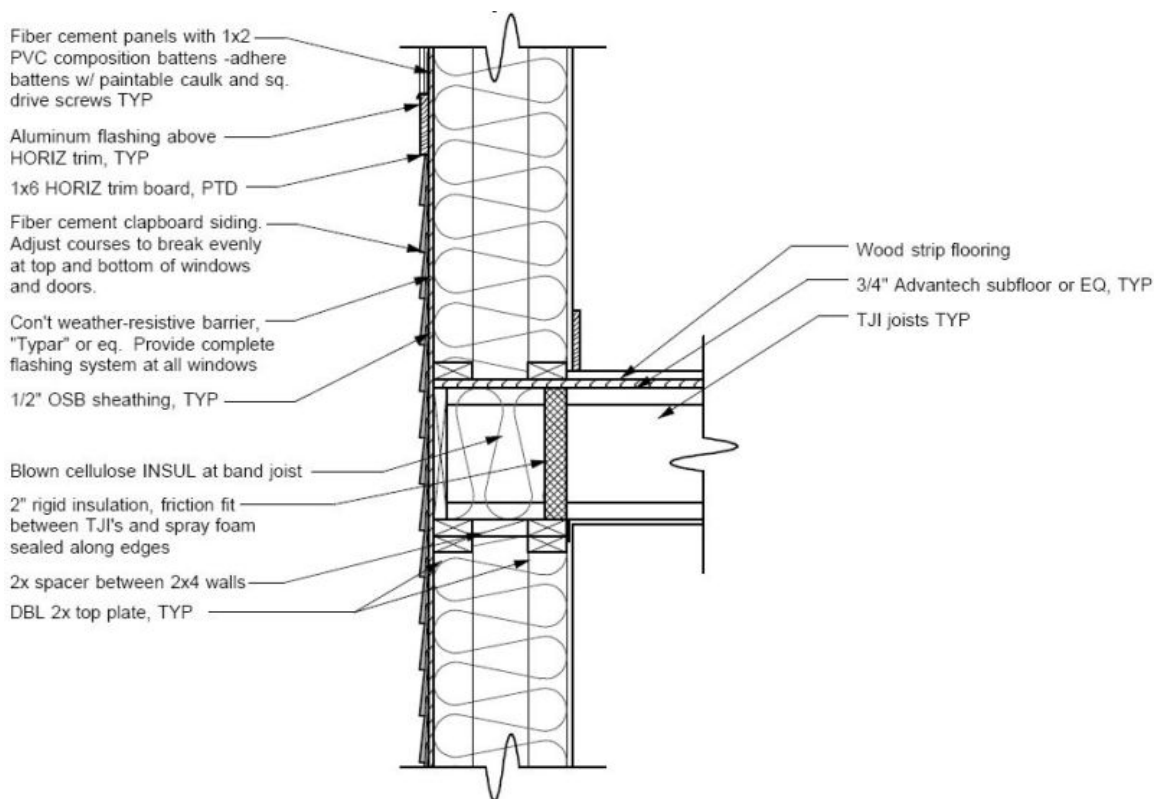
Typical wall section from Austin Design, Inc. Insulation netting was used instead of rigid insulation between floor joists.
